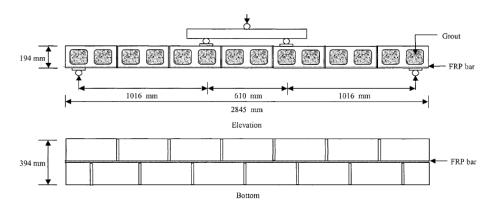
Out of plane bending tests arrangement by Bajpaj & Duthinh [25]
